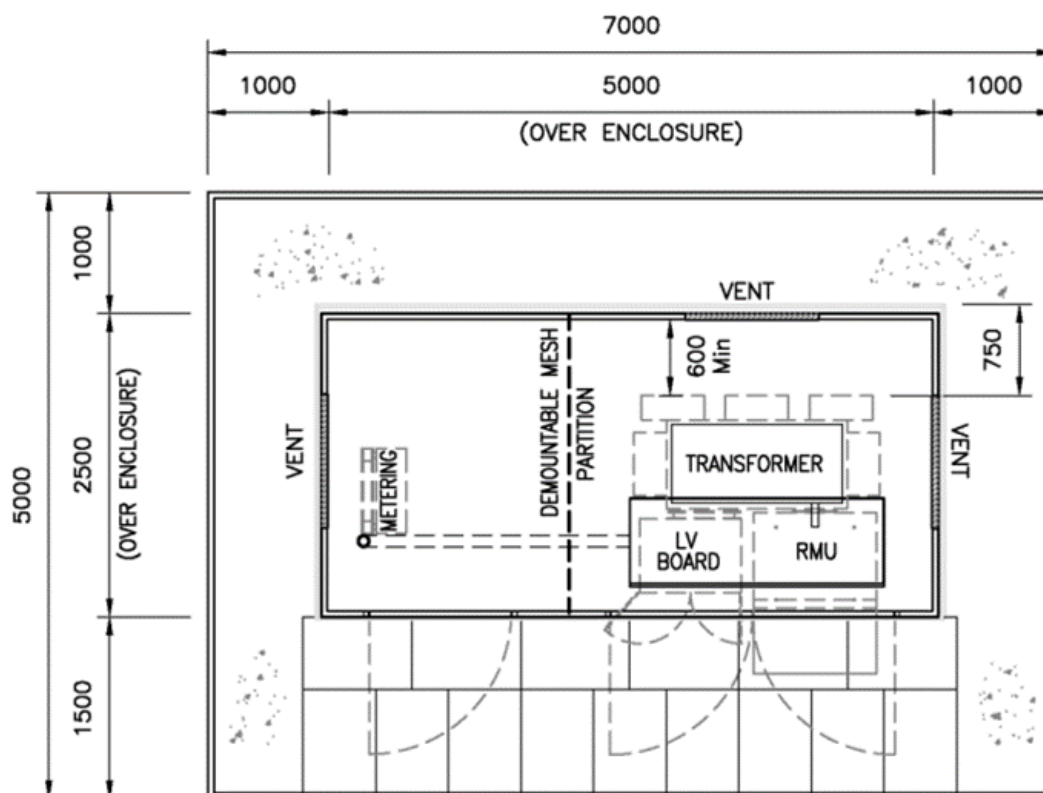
Industrial type substation layout [2] (\*All units are in mm).
